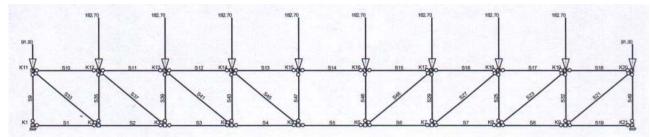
Schematisation loading on truss, as shown in figure 10.18.
